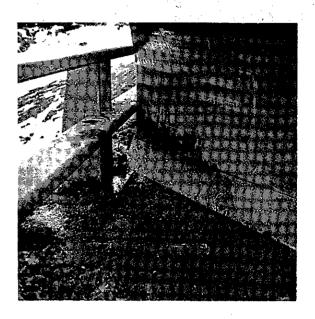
SNOWPLOW SNAGGING ON BASEPLATE BOLTS OF TYPE 8 BRIDGE RAIL
